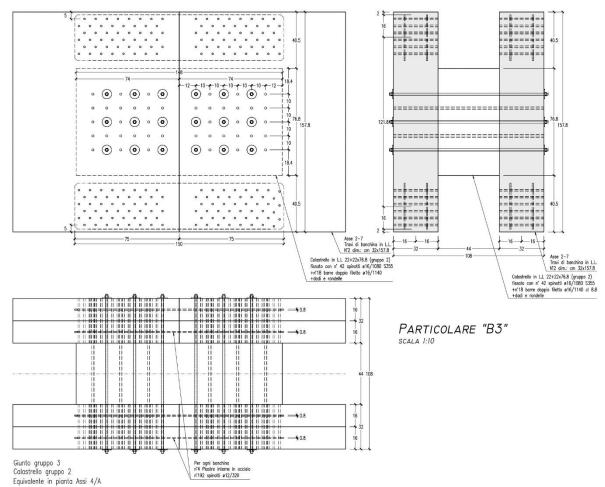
Abstraction from design drawings, rigid joint between the horizontal main beams (side view, section view and top view)
